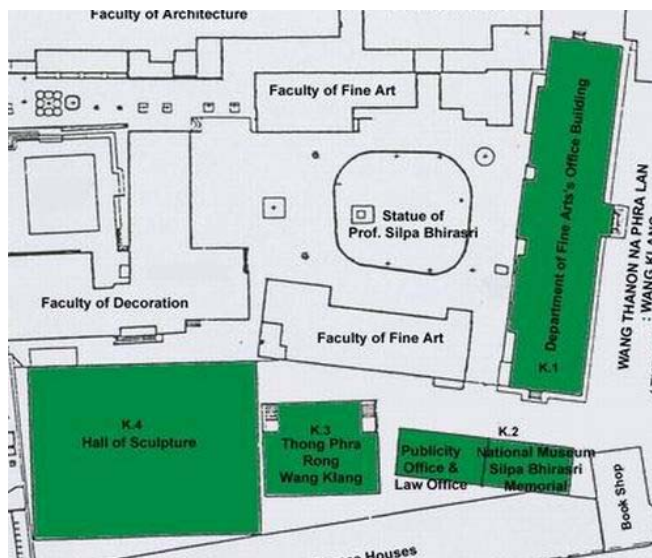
Layout plan of the buildings in the Department of Fine Arts.
